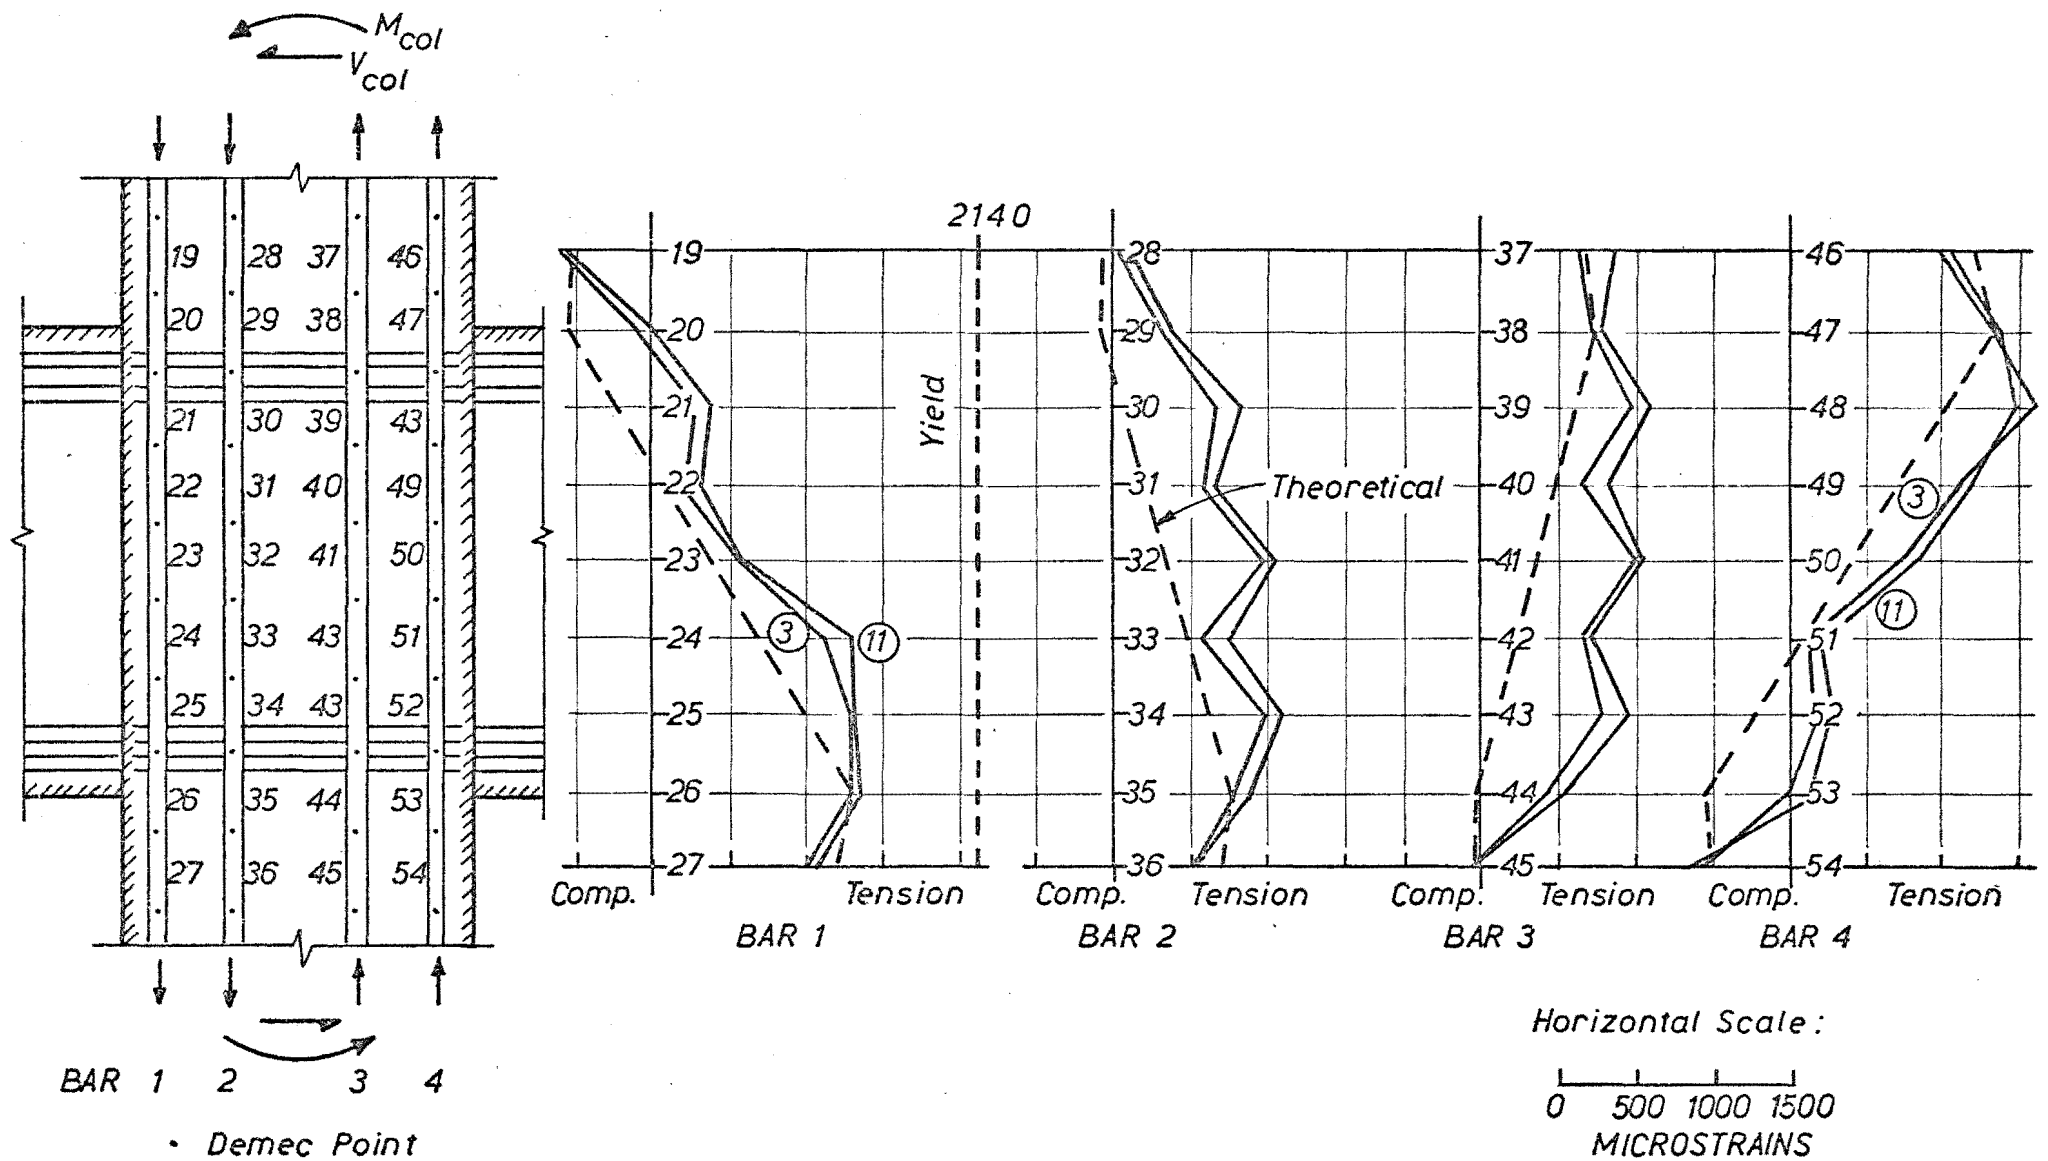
COLUMN BAR STRAINS IN THE JOINT CORE OF UNIT B1
